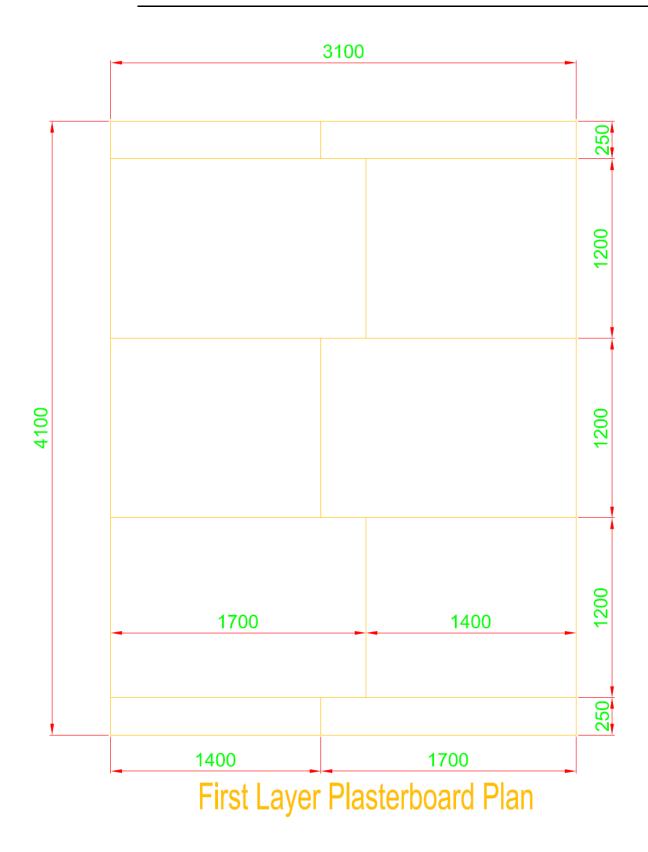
First (Inner) layer view of exposed side of the test specimen.
